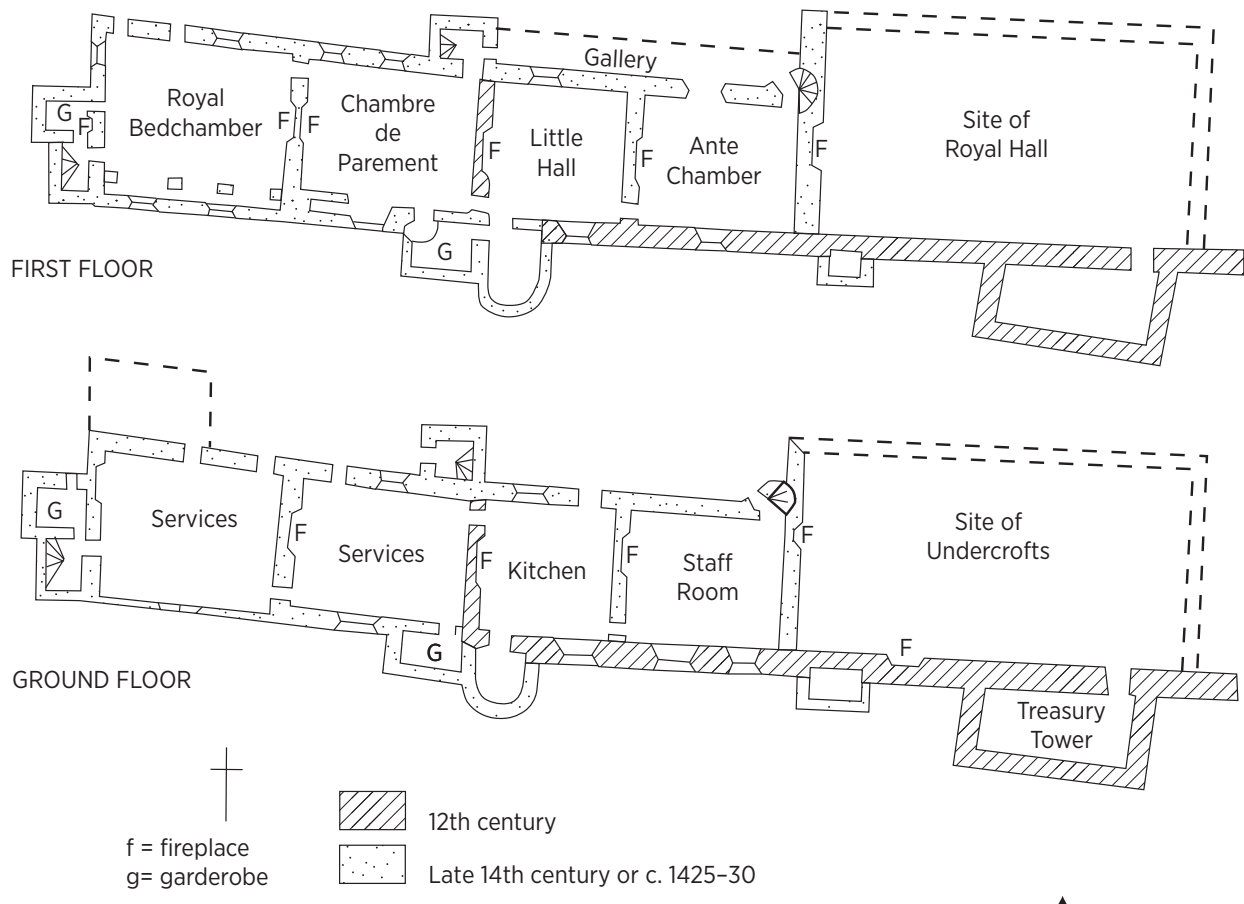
Chinon Castle: site plan of royal apartments c.1430
